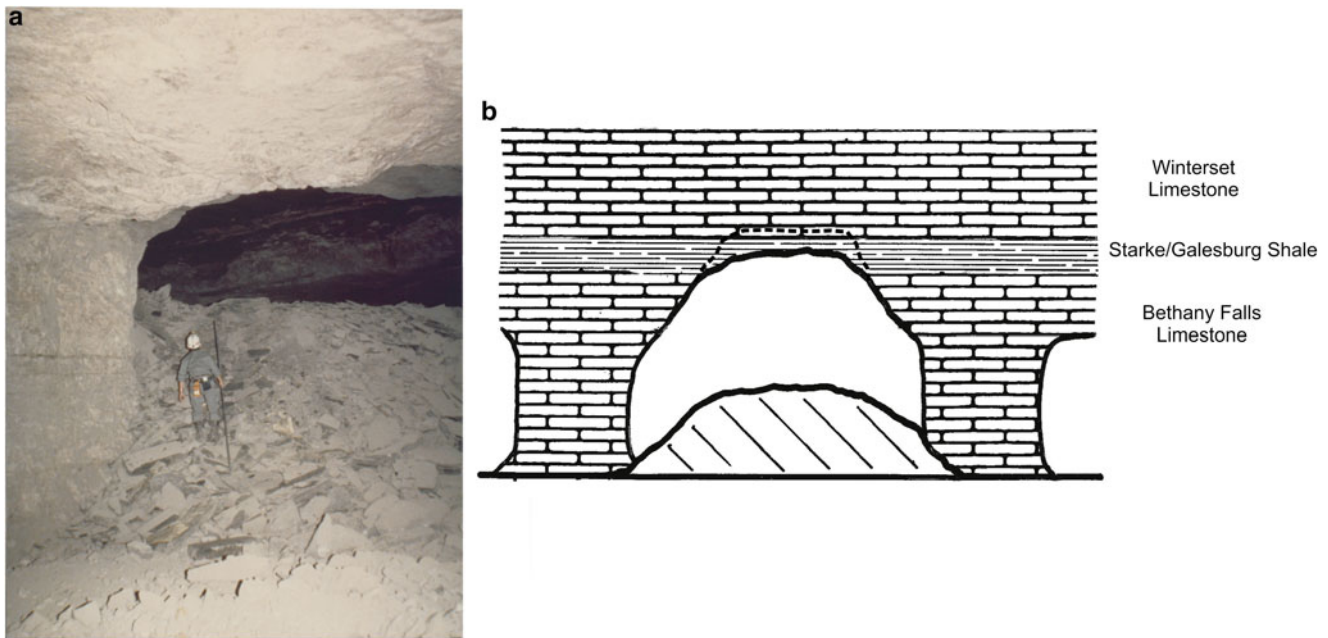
Type A collapse are local, isolated collapse between pillars and would have a typical area of about 334 m² (a). Collapse would extend upward into the Stark Galesburg Shale and in some cases into the Winterset Limestone (b)
